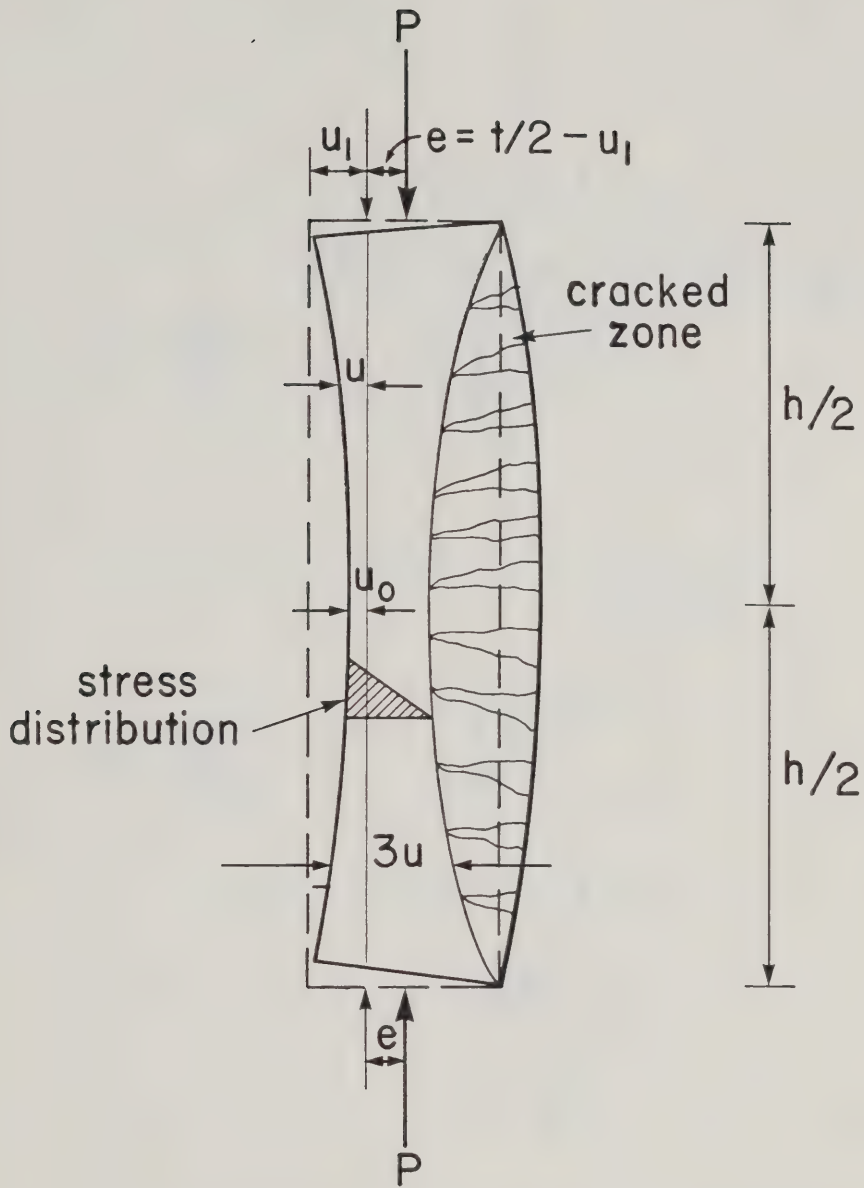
Cracked and Effective Cross-Section of Eccentrically Loaded Wall
